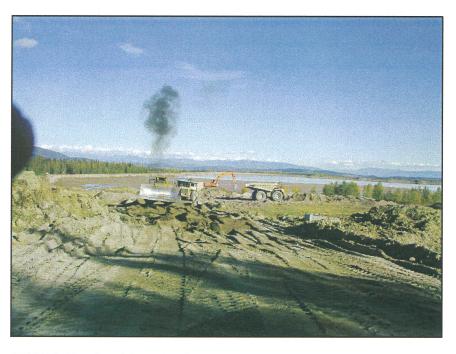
Sand Cell on the Perimeter Embankment.
